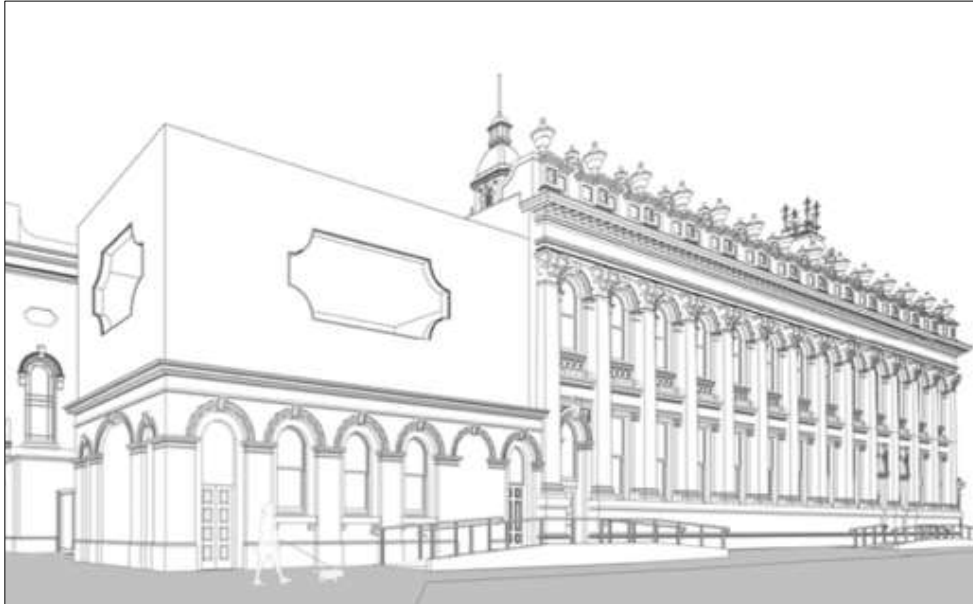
Architect's illustration of the proposed first floor addition, replacing the former assistant librarian's flat.
